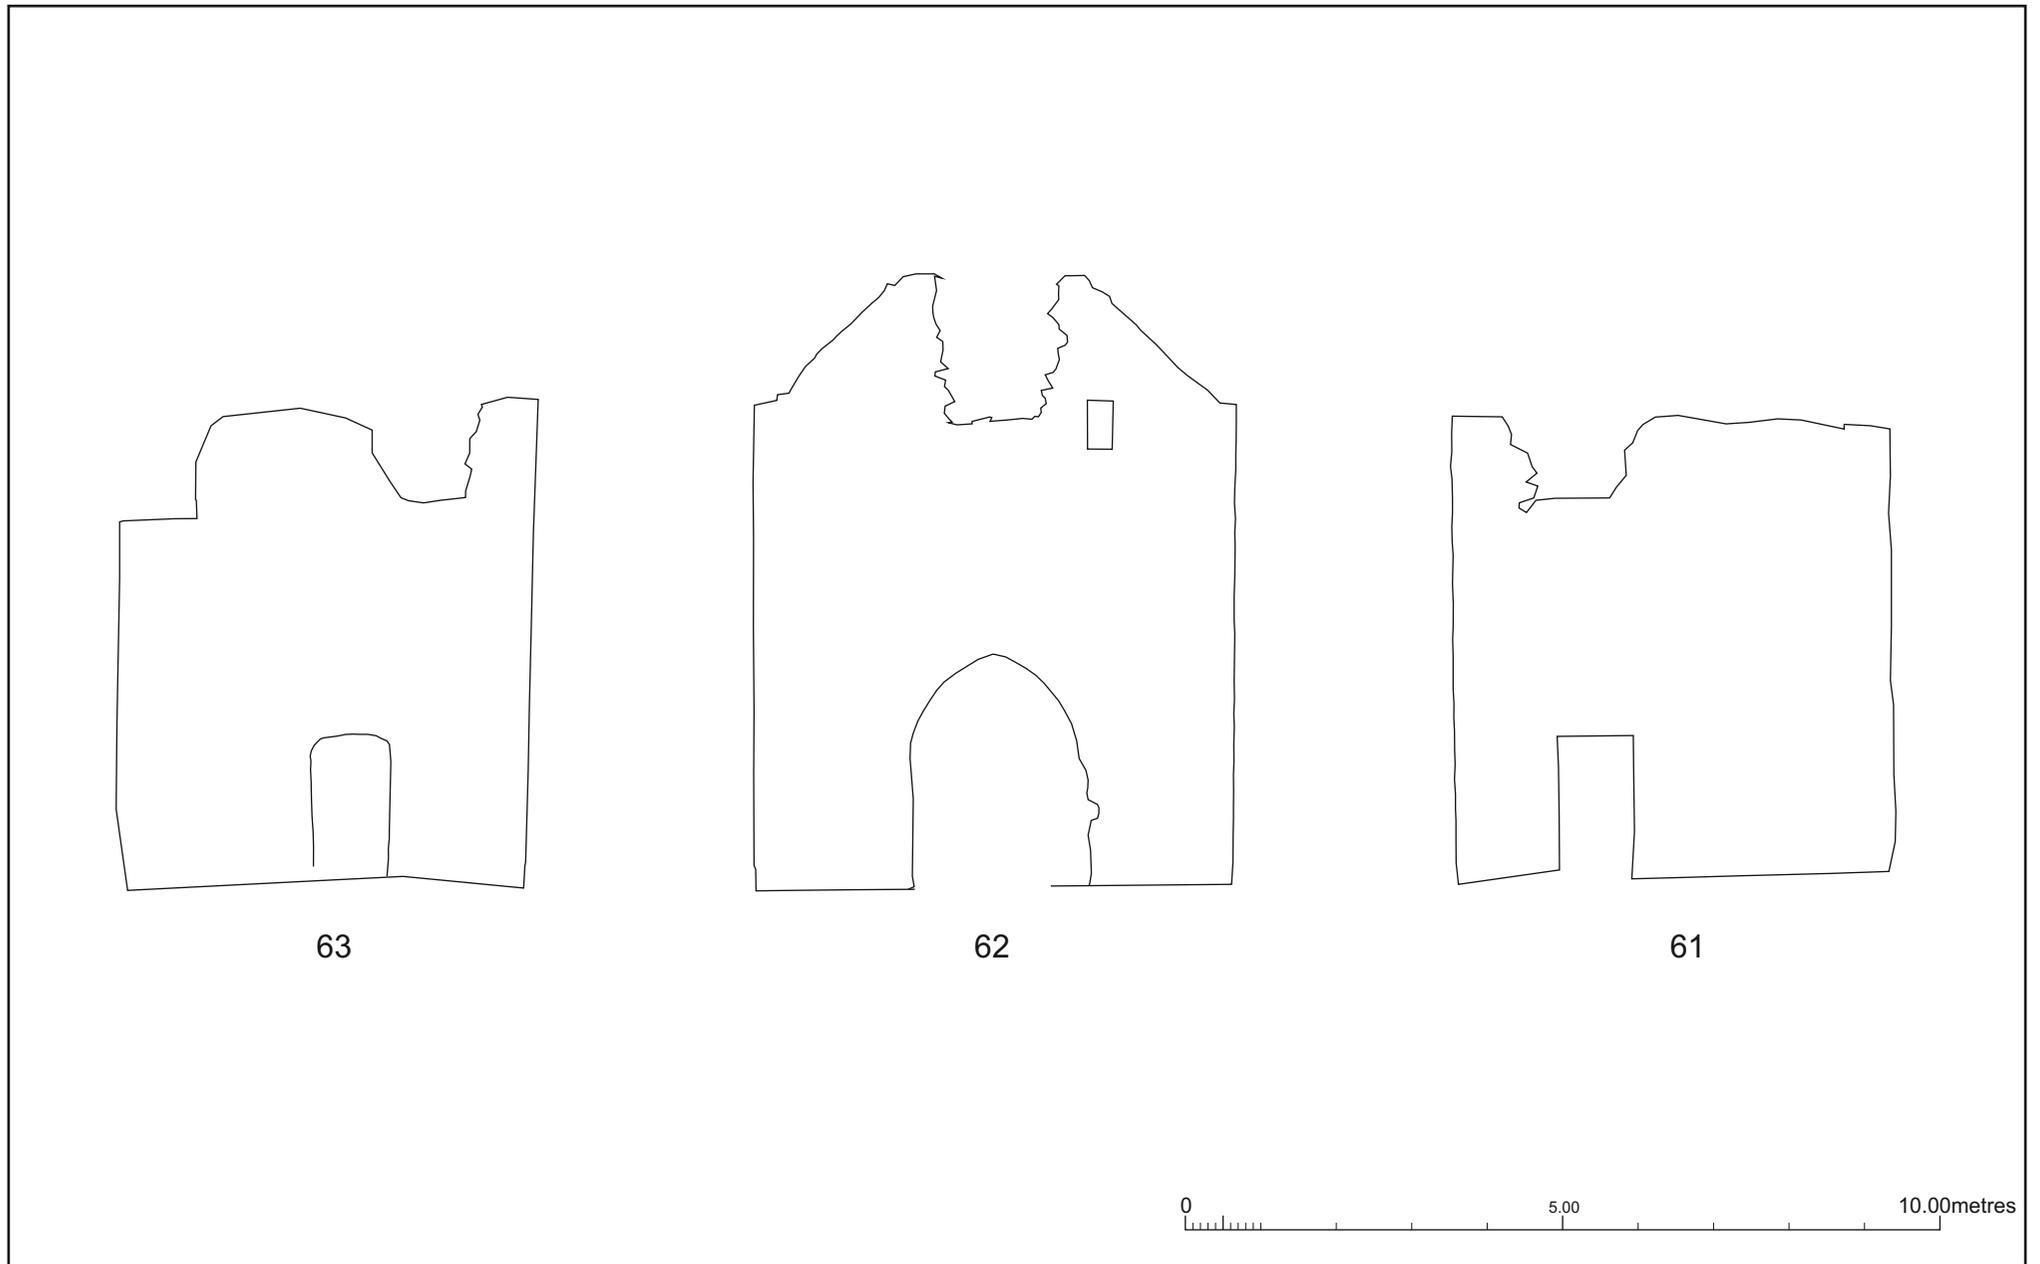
North facing elevation of wall 63, west facing elevation of wall 62 and south facing elevation of wall 61
